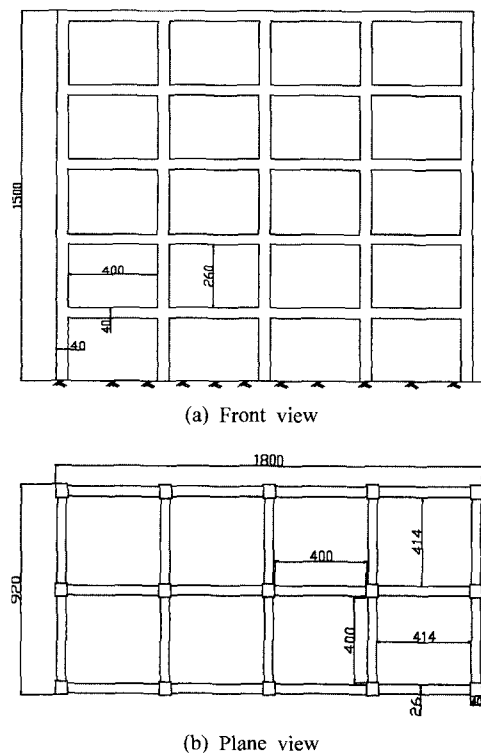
Front and plane view of scaled model structure (unit: mm)
